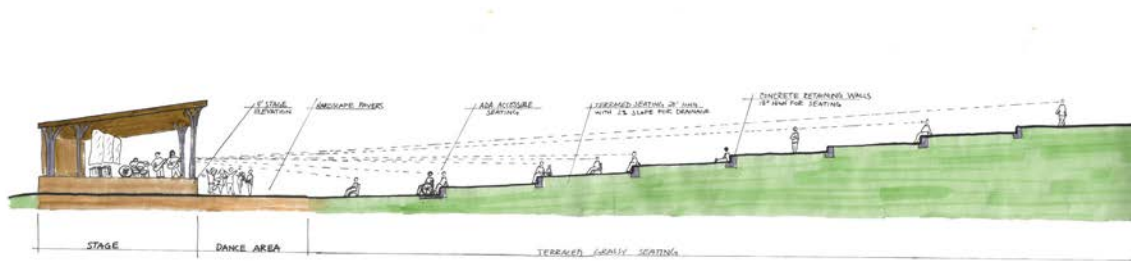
Section cut showing views across the proposed terraced seating and the new stage design.
